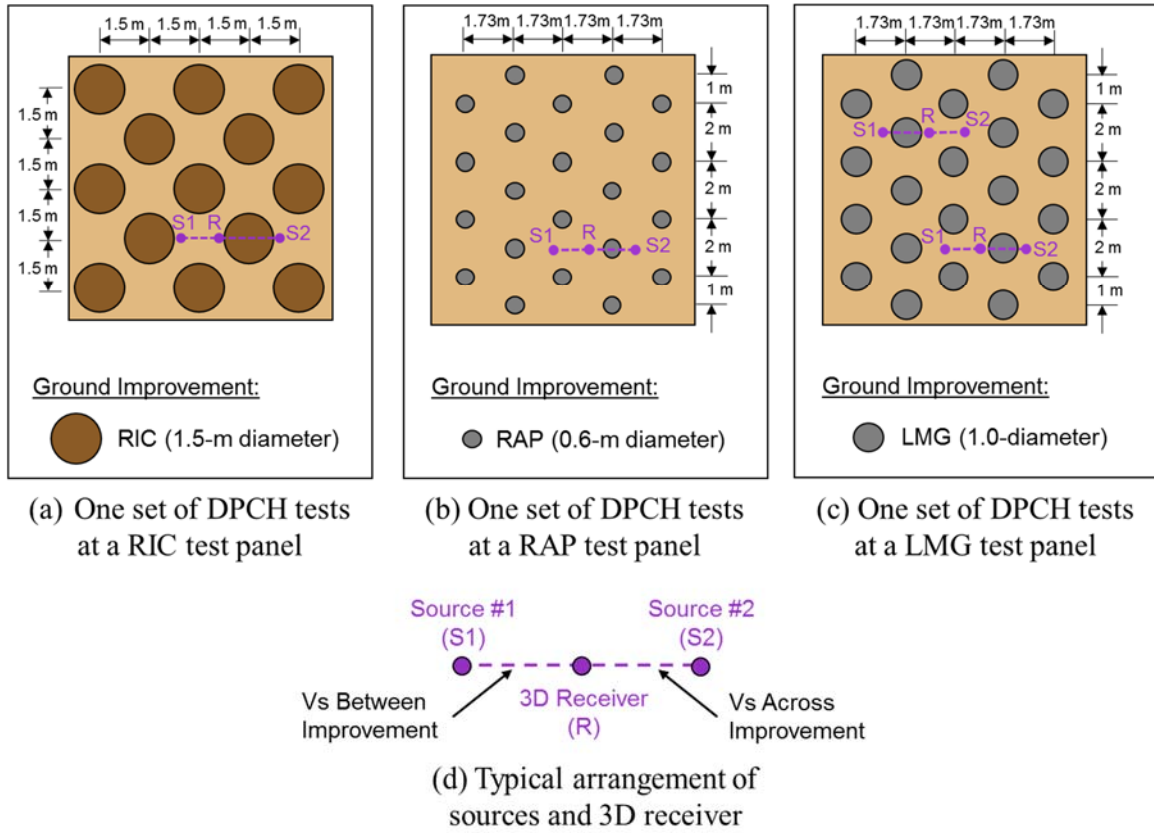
Plan view of DPCH test locations at the three ground improvement test panels (a) RIC, (b) RAP, and (c) LMG and (d) the typical arrangement of sources and 3D receiver for the DPCH test.
